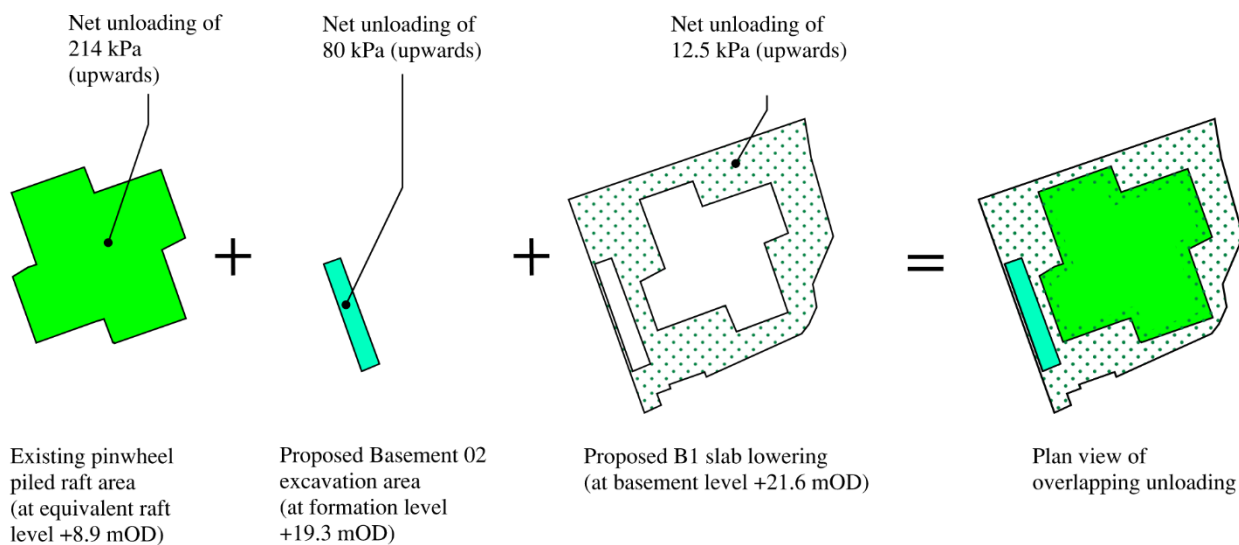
Net unloading applied in Oasys PDISP model, resulting from partial superstructure deconstruction, proposed B2 excavation and B1 slab lowering.
